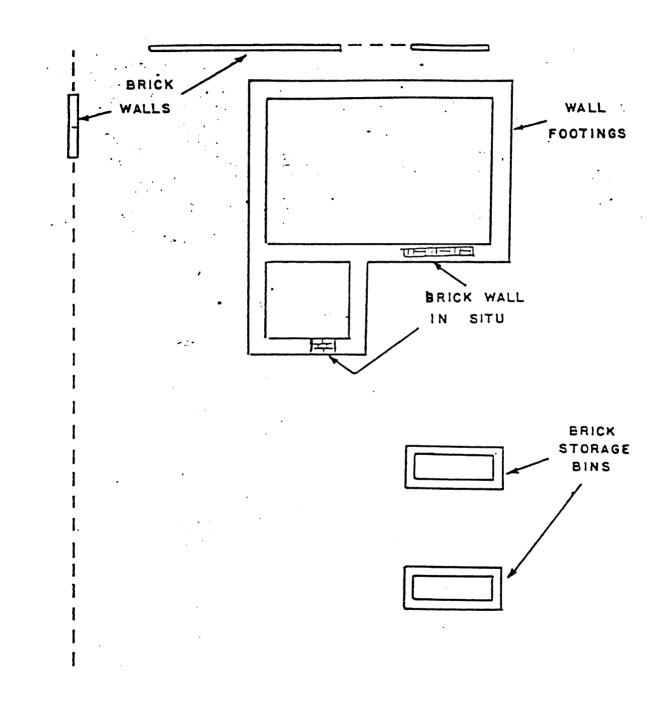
Plan of Dunbar-Houstoun house-Lot 4S
